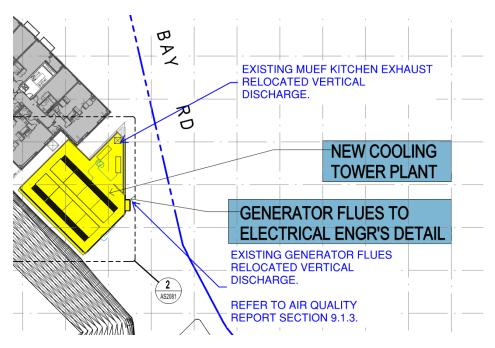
Level 09 Plan view - Existing MUEF kitchen exhaust discharge location.
